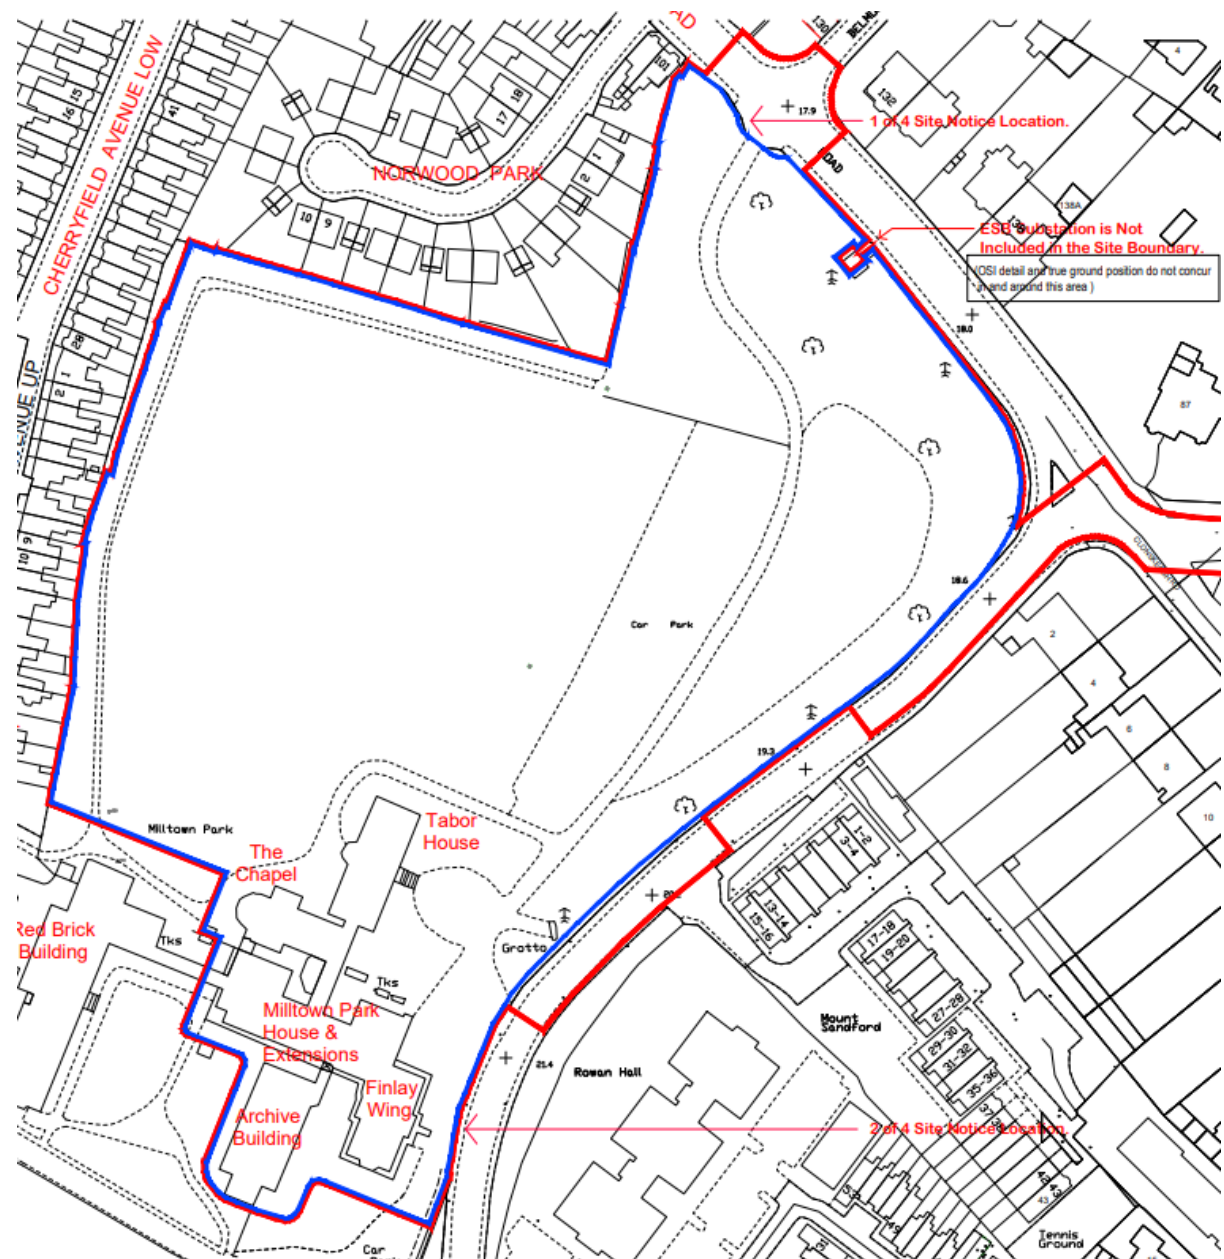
Applicant site boundary enclosing the existing Milltown Park building range.
